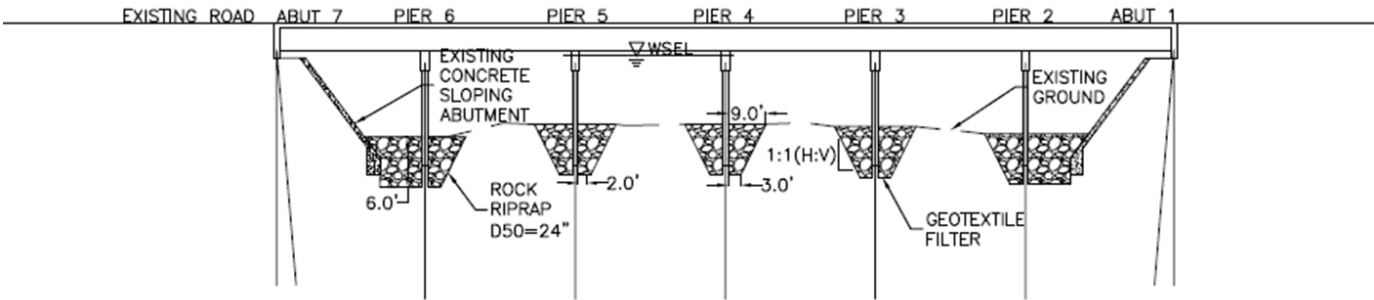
Cross-sectional view of Bridge A-28-M with recommended hydraulic scour countermeasures
